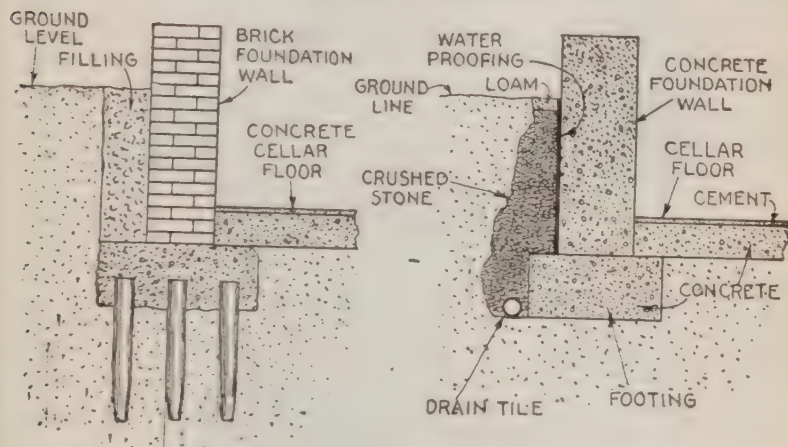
,765.—Foundation construction showing footing of piling embedded in concrete cap, and brick foundation wall, the cellar being provided with a concrete floor.
